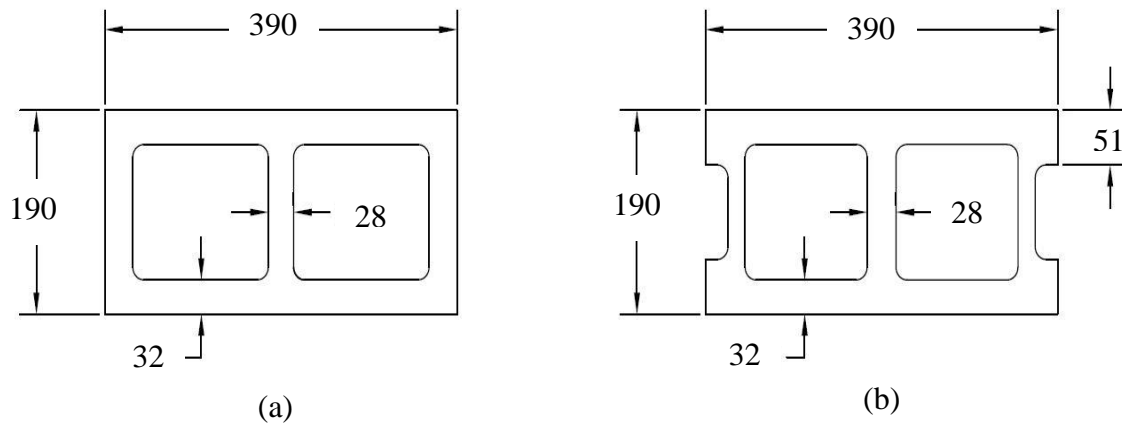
Typical Concrete Blocks Used in Construction: (a) Flat- Ended Block, and (b) Frog-Ended Blocks (Dimensions in mm)
